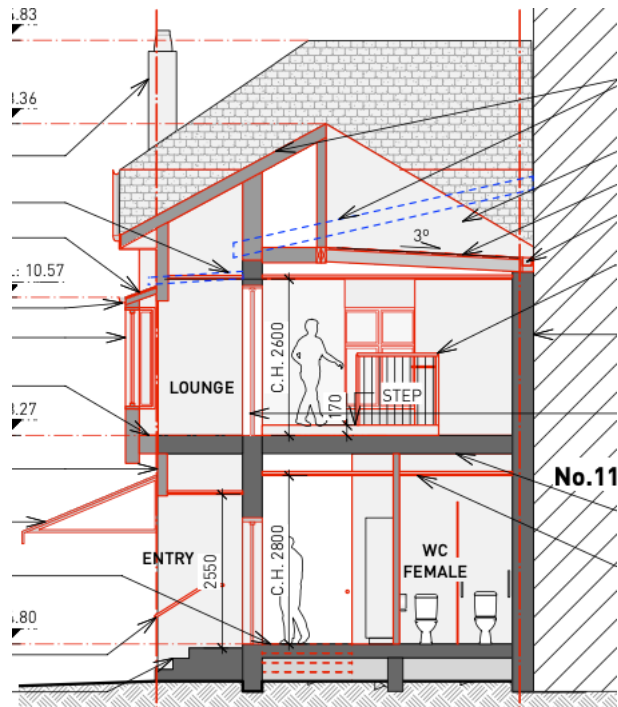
, Proposed Section B, U+I Building Studio, Mar 2021.
